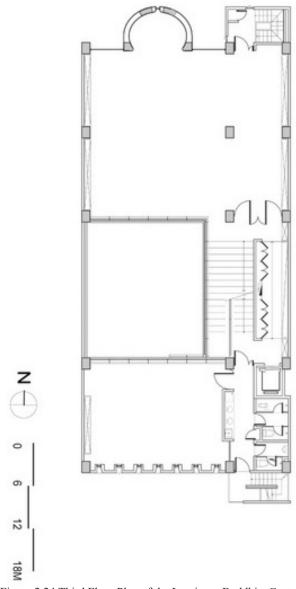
Third Floor Plan of the Luminary Buddhist Center
